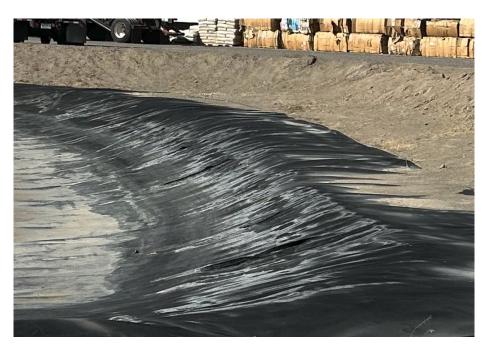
Stormwater pond pre-construction 11/11/24. *Facing northwest.
